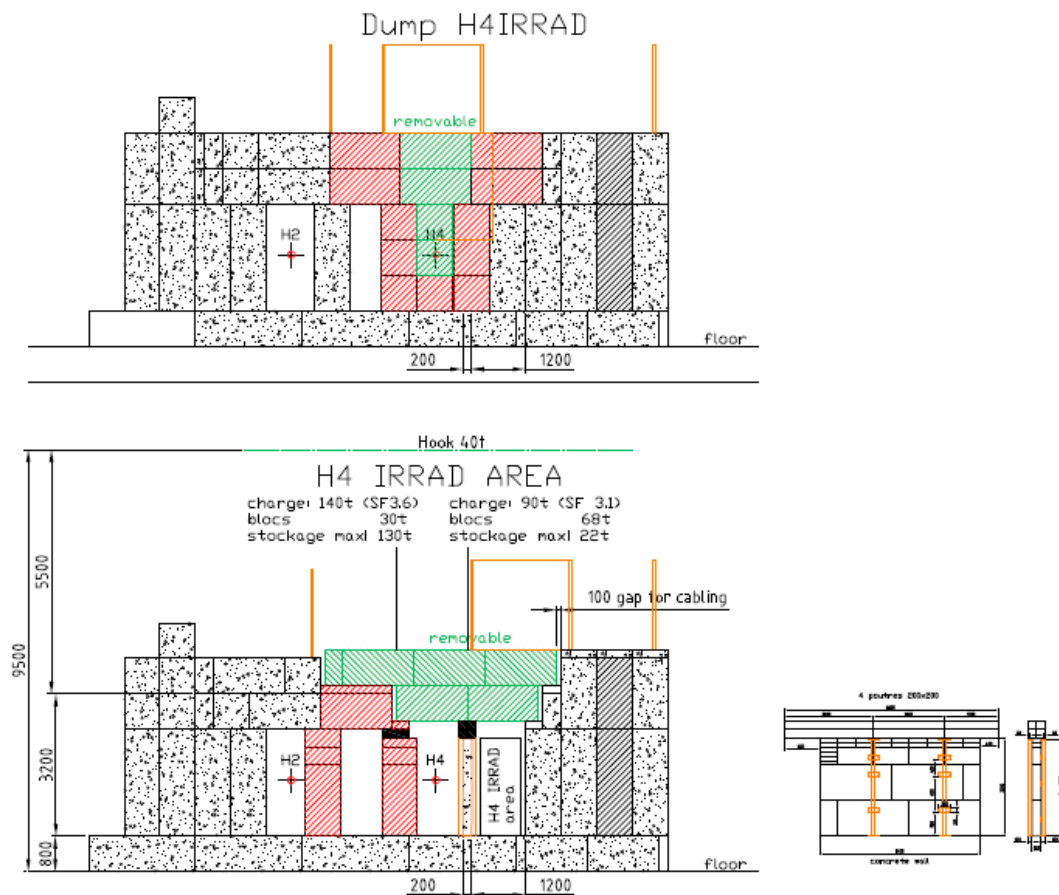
Technical drawing of H4IRRAD iron beam dump (upper plot) and irradiation areas (lower plot) with marked removable iron parts (vertical view from H4 upstream, dimensions in mm) [52].
